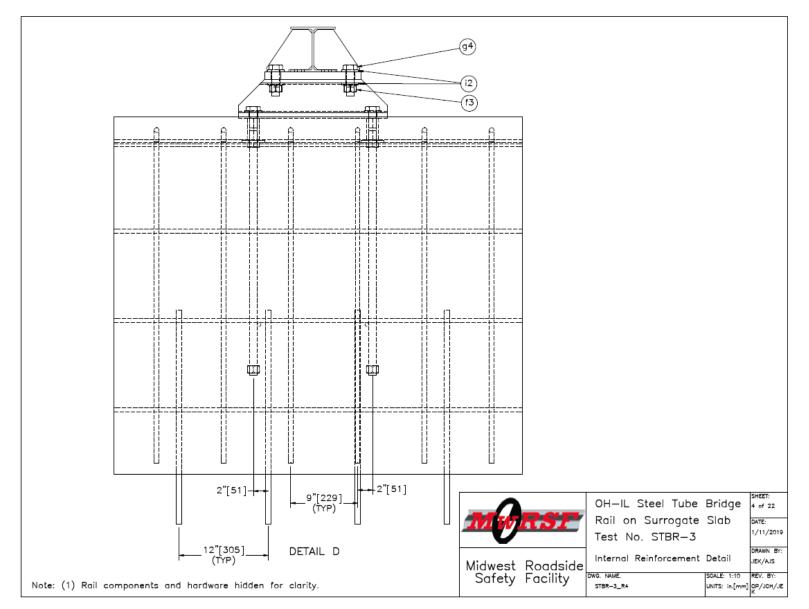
Lateral Reinforcement Detail, Test No. STBR-3
